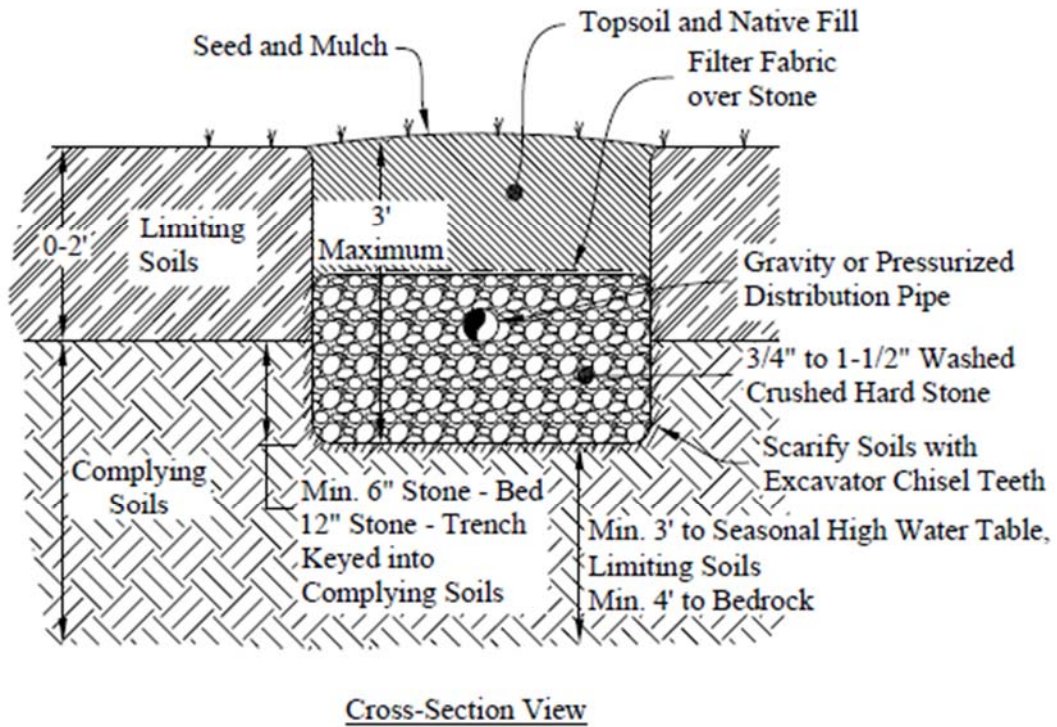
Detail of Typical Shallow Trench Wastewater System
